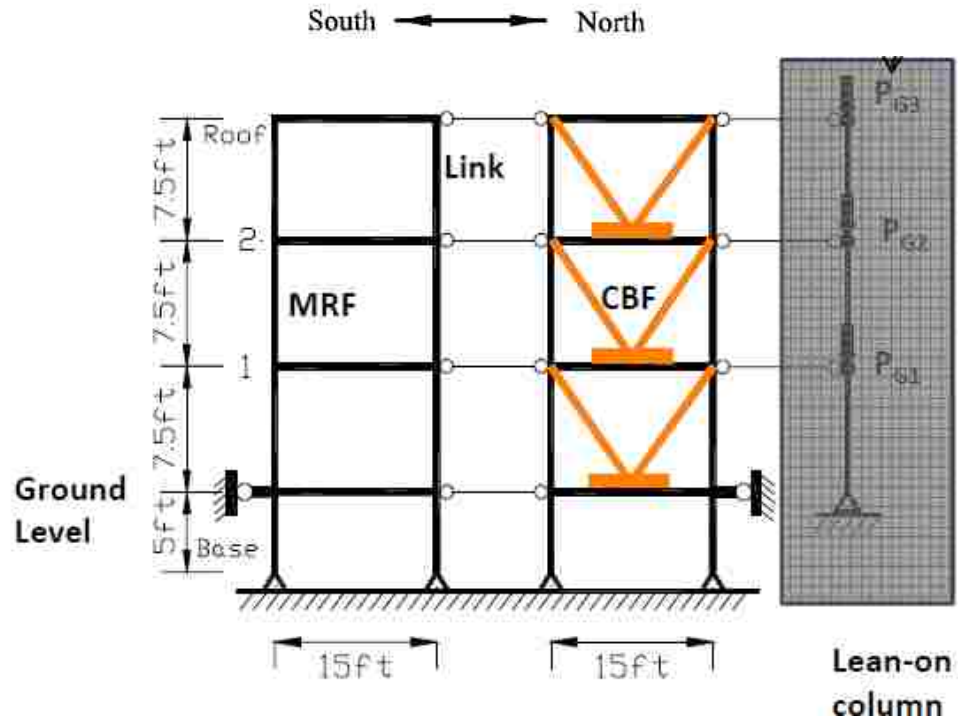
Elevation of 0.6-Scale Test Structure (Dong, 2013)
